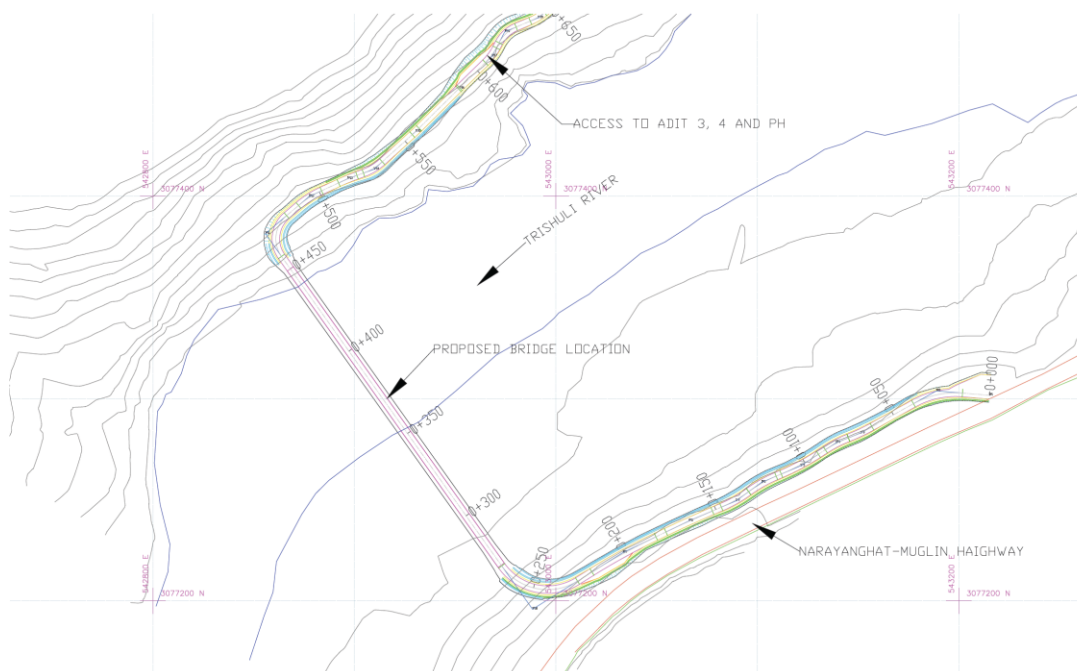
Proposed location of bridge at powerhouse site (Source: Detail Design Report, 2021)
